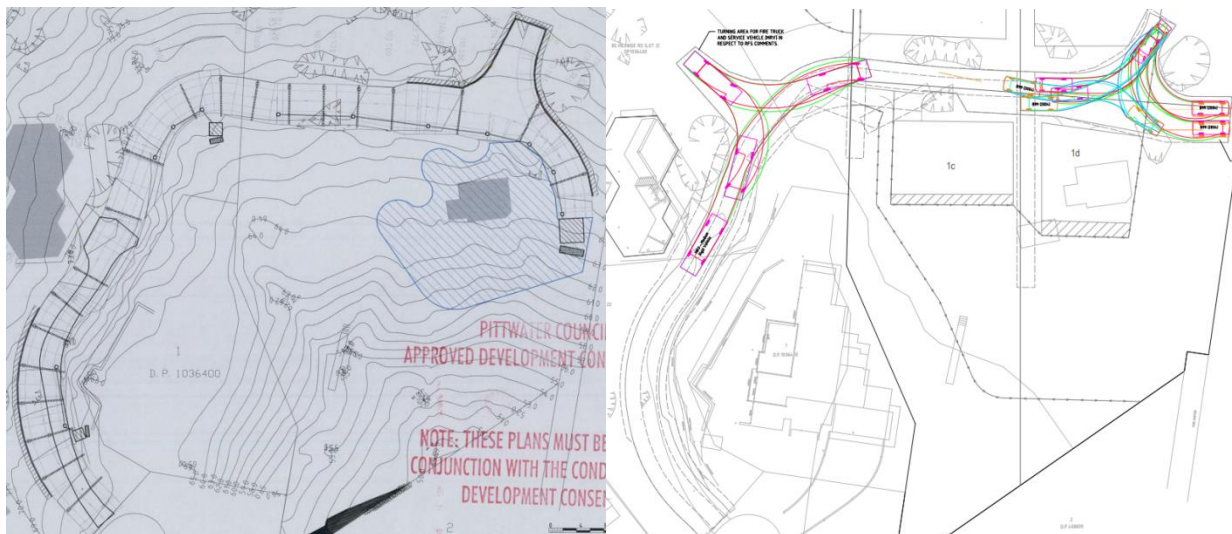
Extracts of the approved plans from Development Consent No. N0274/09 (left) and proposed driveway plans (right) comparing the differences between the approved driveway and proposed modifications.
